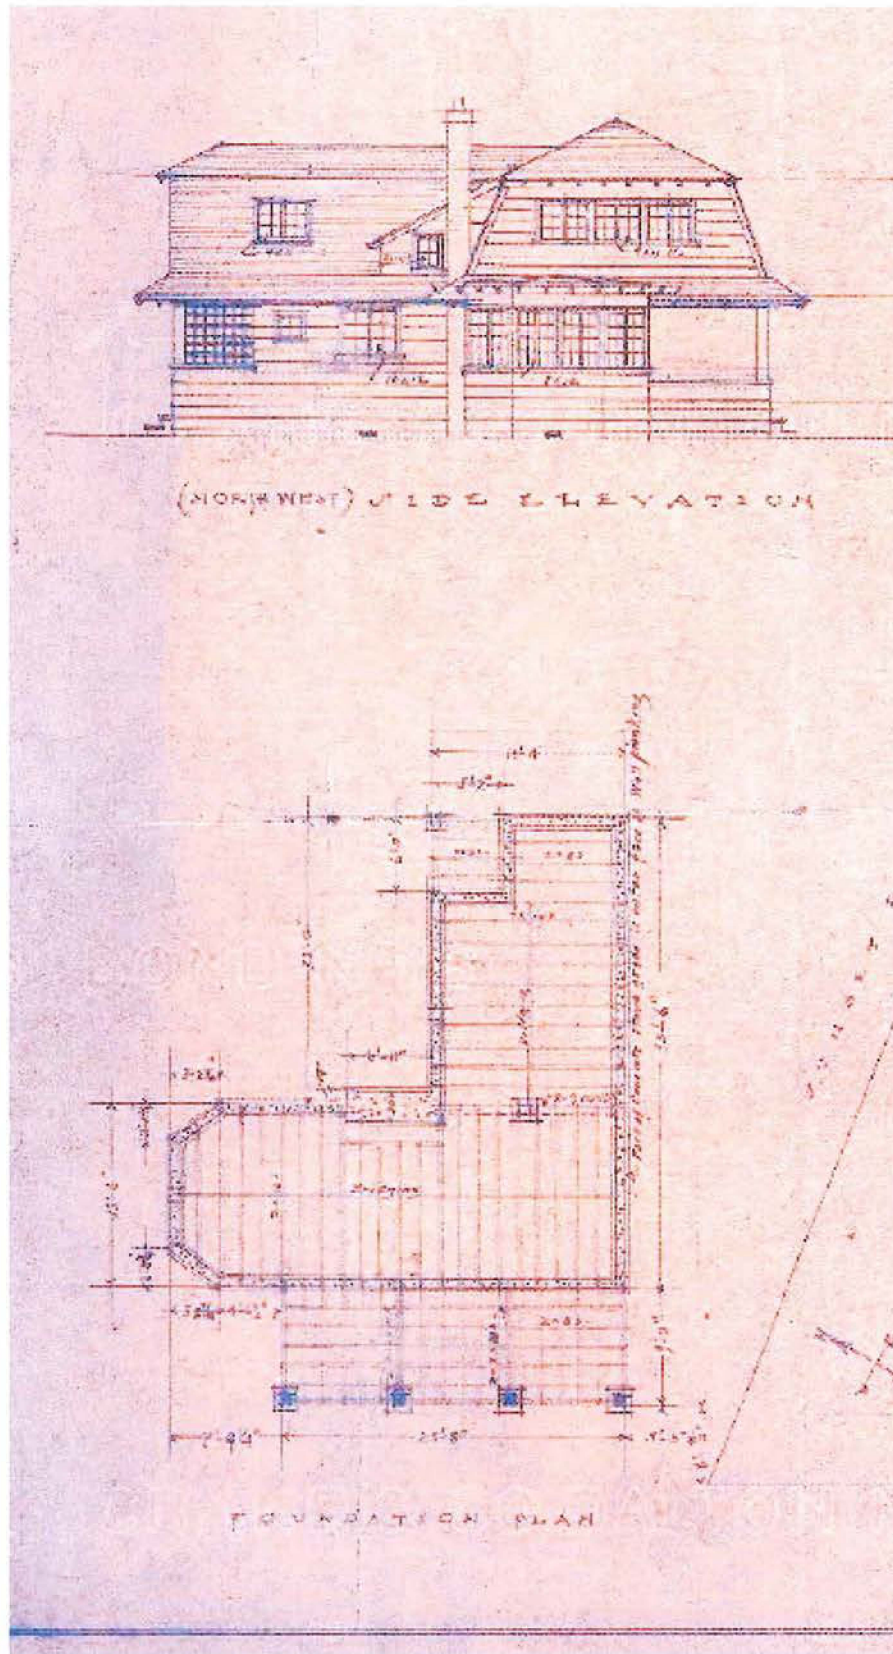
Hokanson's drawing of the west (side) elevation and the foundation plan.
